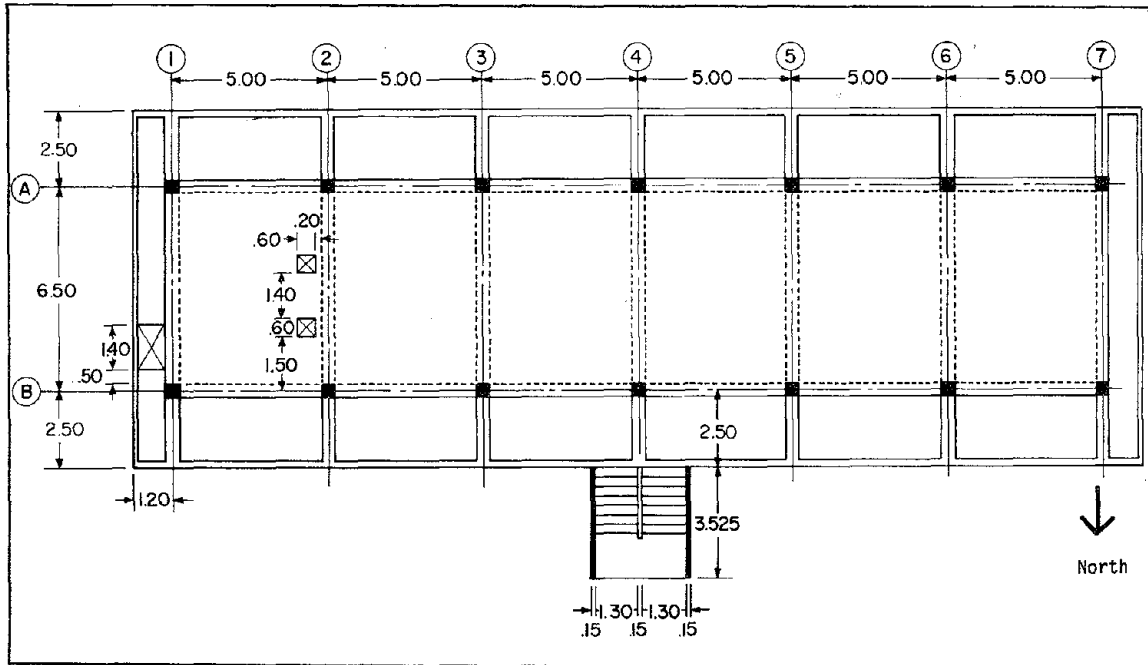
STRUCTURAL PLAN OF THE ESCUELA DE NIÑERAS
